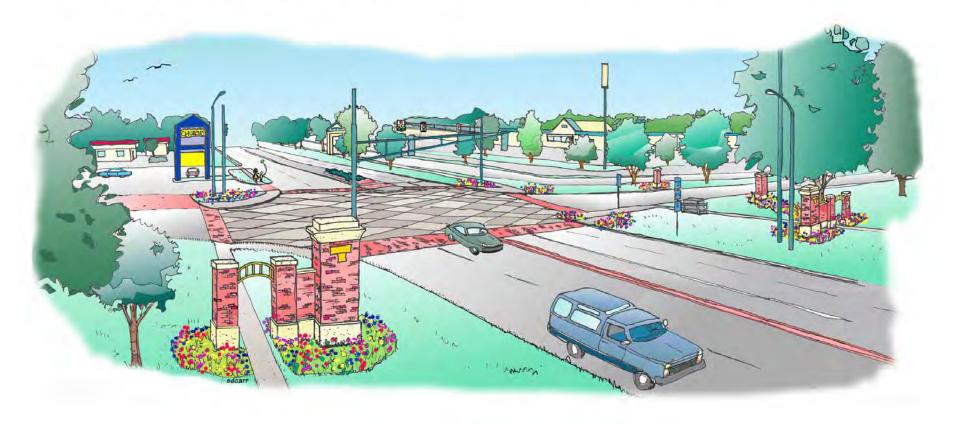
BROOKSIDE ENTRY AT SKELLY DRIVE - CONCEPT ILLUSTRATION PLAN VIEW
